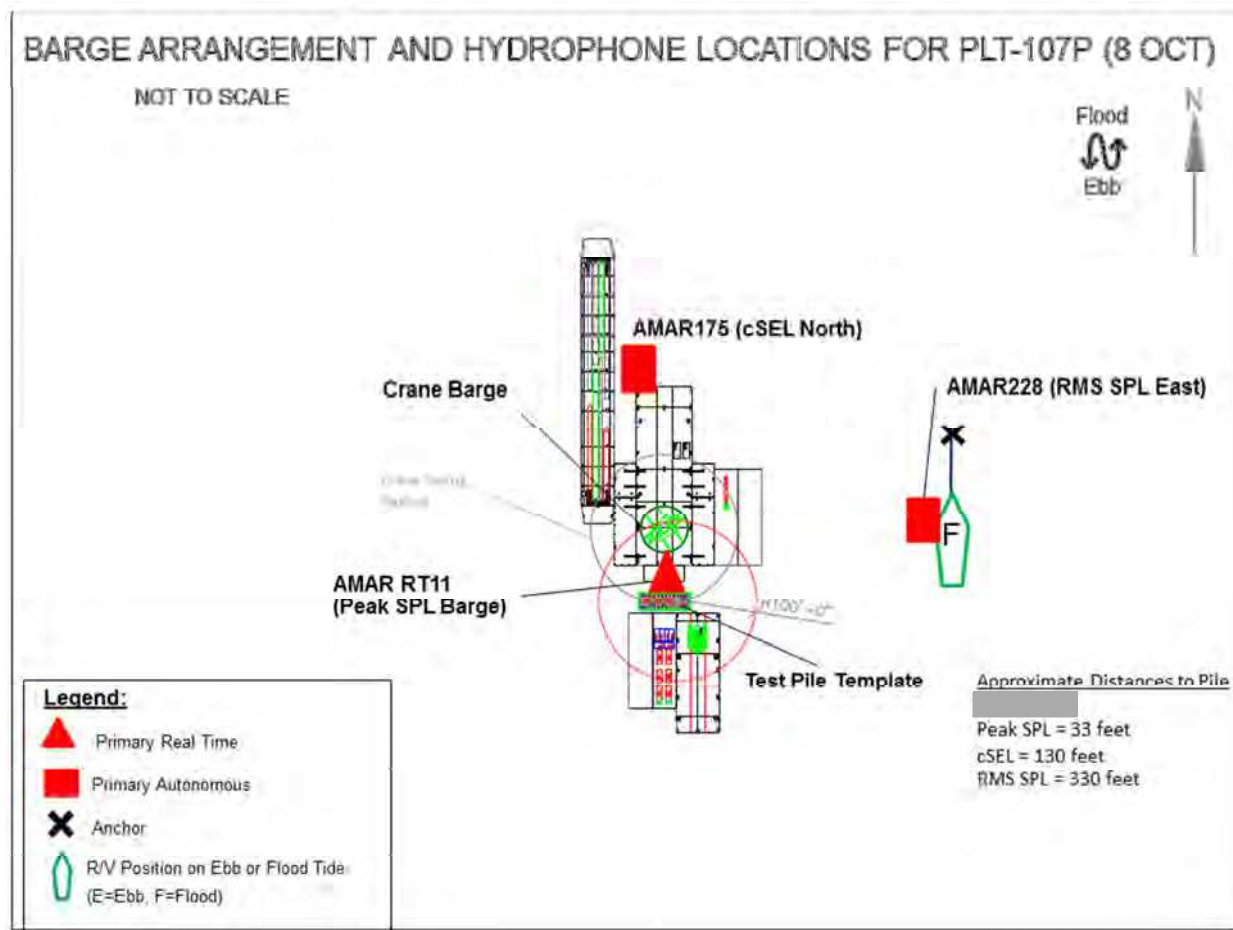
Plan view of pile and barge layout, 08 October 2013, Test Pile PLT-107P.
